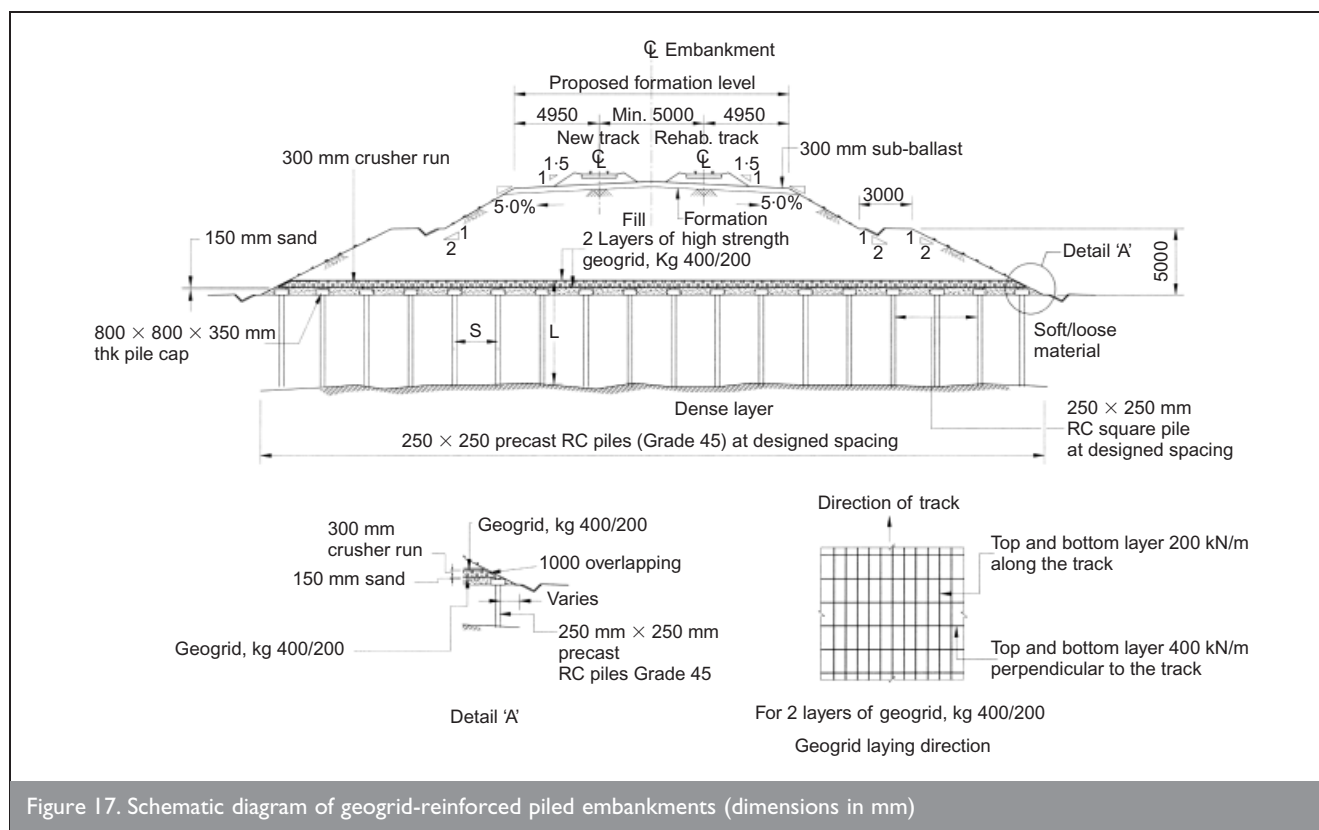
Schematic diagram of geogrid-reinforced piled embankments (dimensions in mm)
